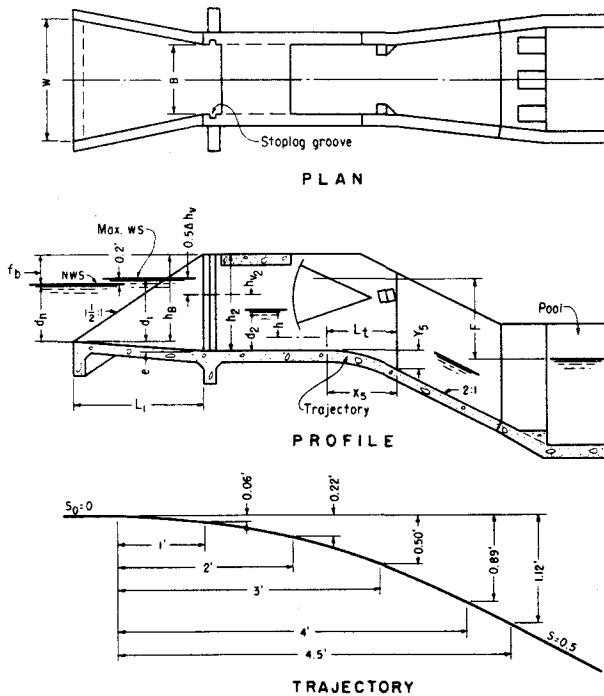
Radial gate wasteway turnout—typical sections. 103-D-1300
